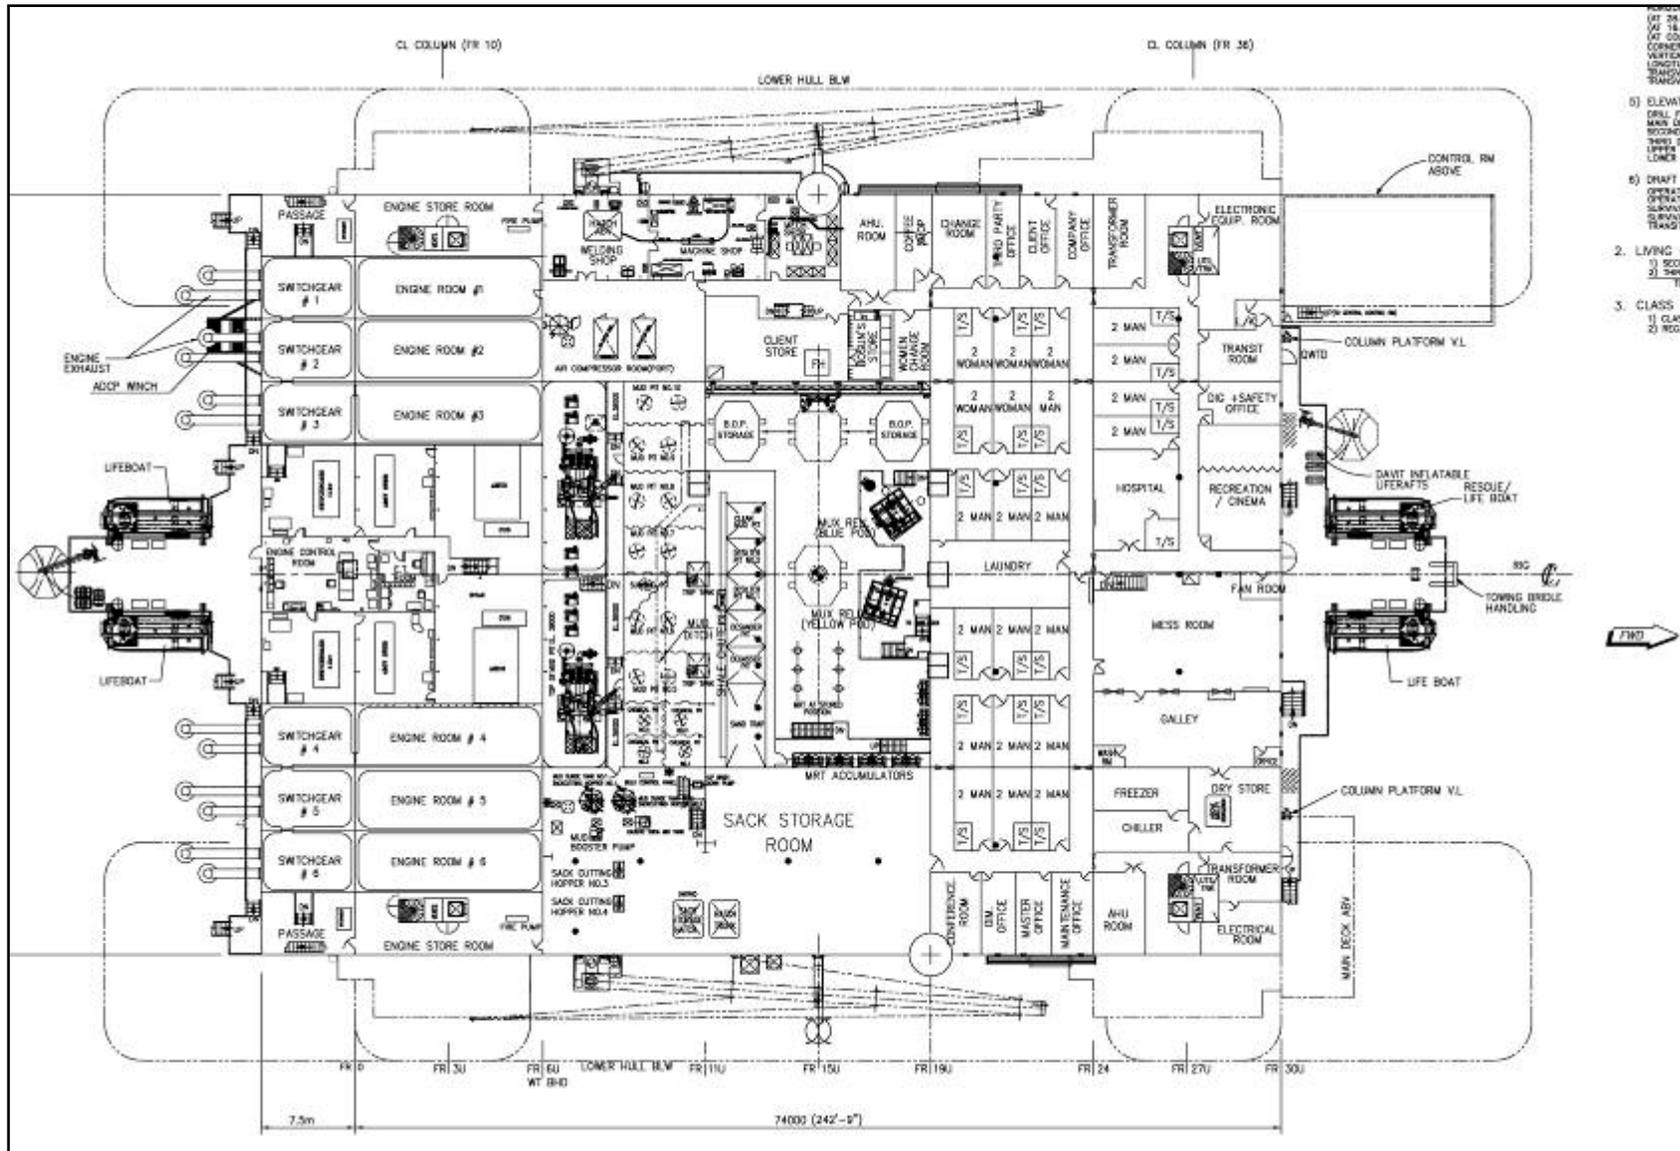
Second Deck Layout Drawing (HRBS-058-000-P0608, rev.5)
